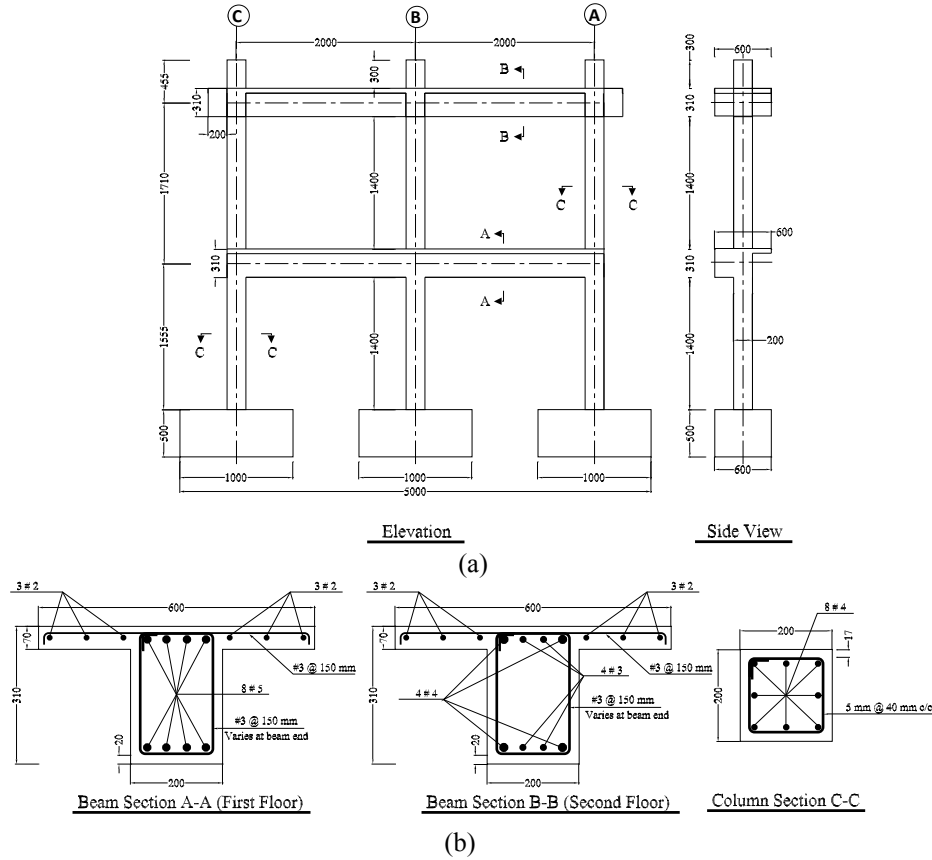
(a) Shaking table test specimen and (b) reinforcement details. Units are mm (Yavari 2011)
